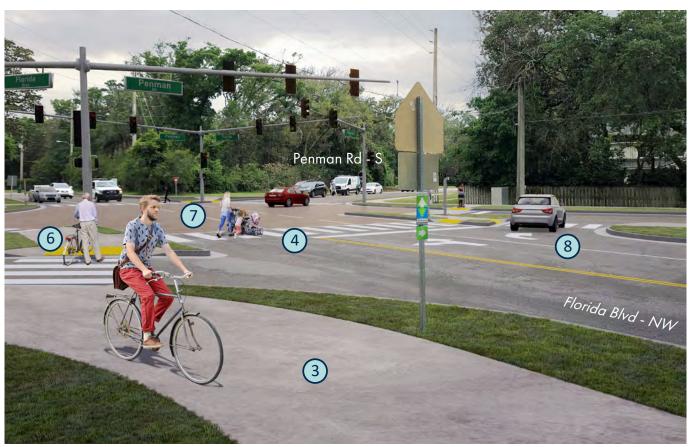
Penman & Florida Intersection: Proposed Signalized Intersection with Pavers
